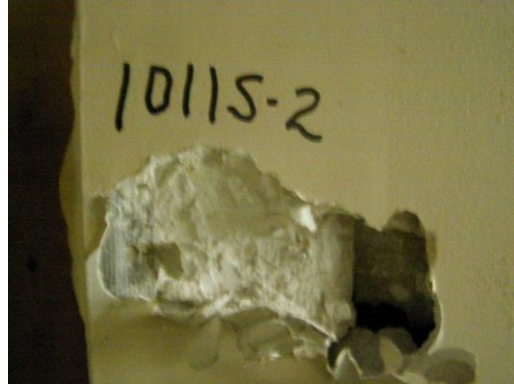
Drywall/J.C. (1011S-2) Kitchen, Wall A.
